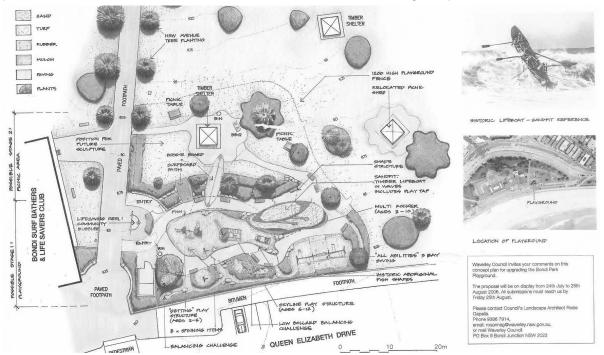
Extract of 2006 concept plan of the playground upgrade - built largely according to this plan. Note the realigned path, curved wall and garden bed left of the tunnel entrance, playground entrance moved to the side and the tree planting along the playground side of the path. Source: WC LSC Engineers plan $859\,I$ - $0\,I$
